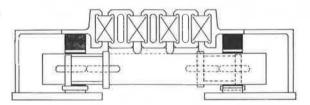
Urato Bay Bridge at Kochi, Japan, incorporates modular system at main-span joint.
